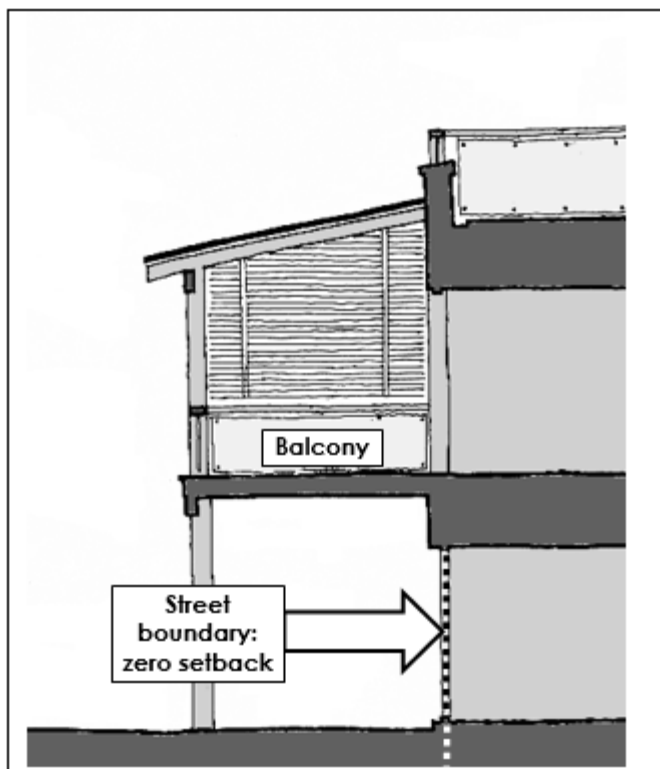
Street front setback. Section illustrates lower storeys built to the boundary
